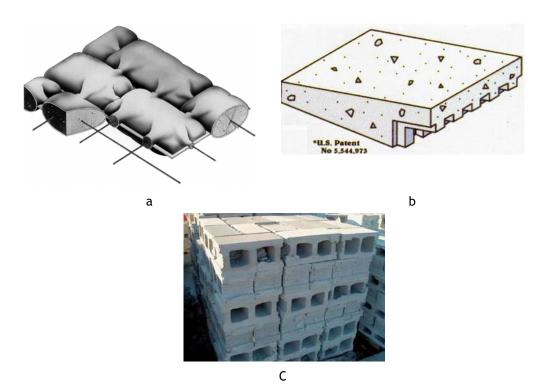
a) Fabric-formed AB mat b) Armorwedge tapered block c) Concrete construction or cinder blocks (Reclamation).
